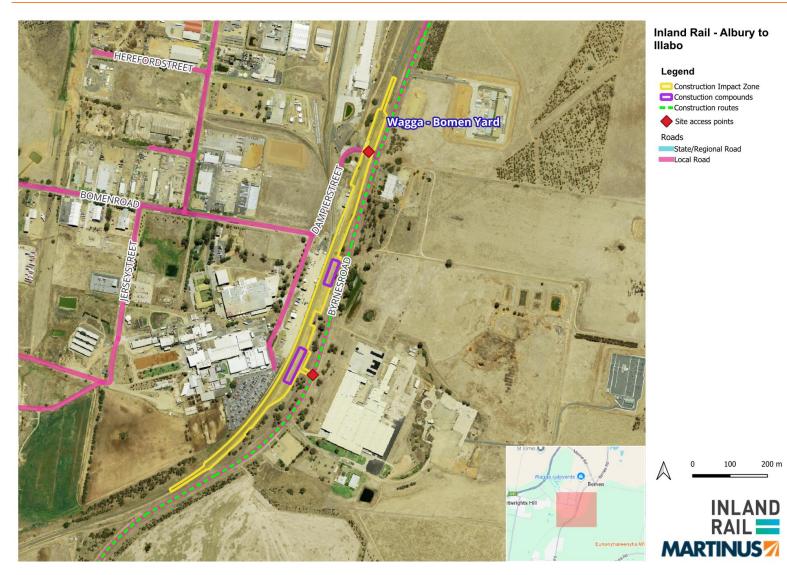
BOMEN YARD CONSTRUCTION ROUTES
